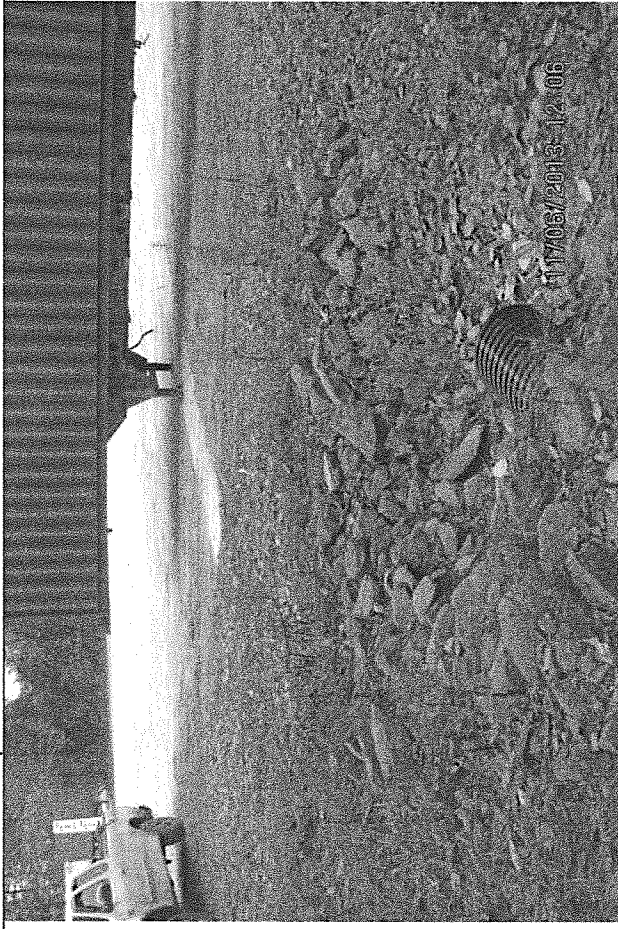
Entrance to outfall 012; drainage from mill truck parking area.
